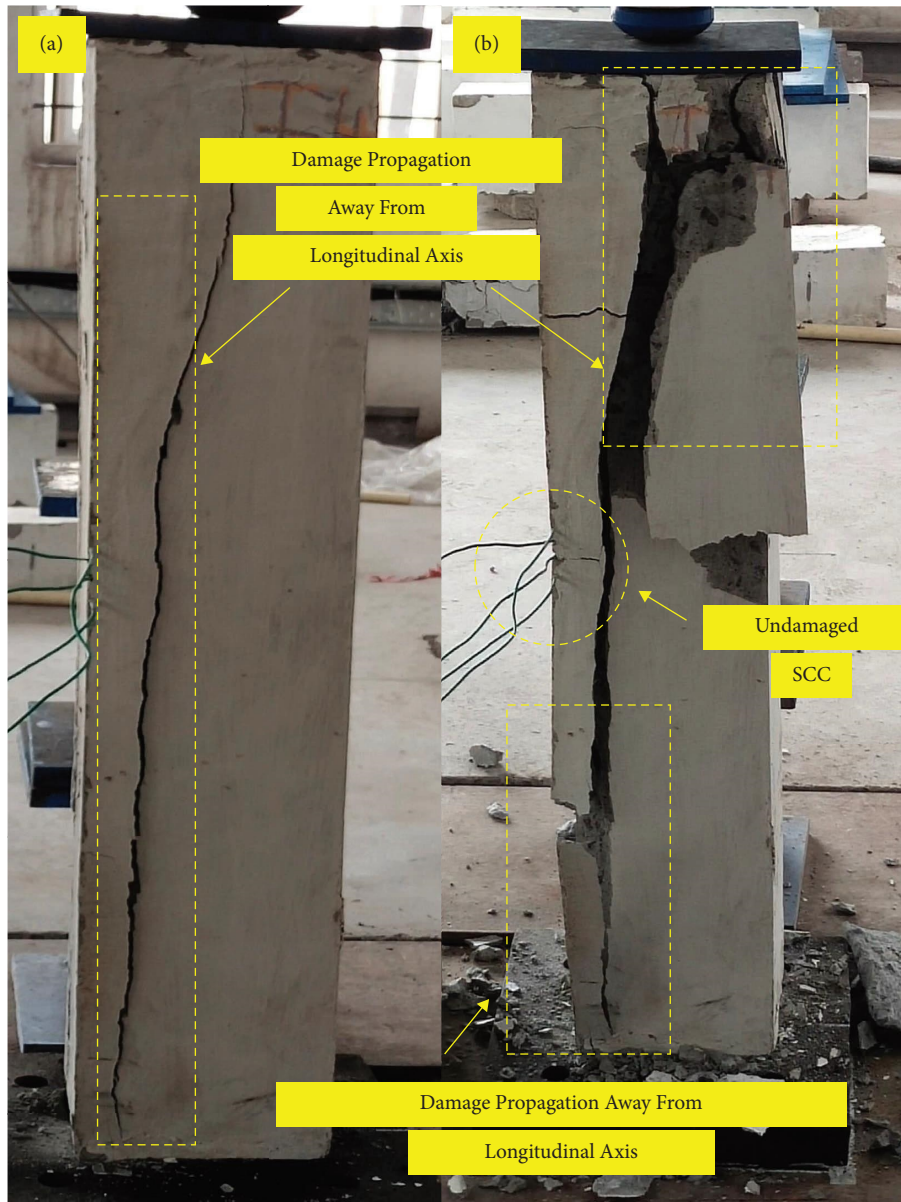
Real-time image of a failed concrete column with embedded SCC integrating AC, showing (a) concrete damage propagation away from the longitudinal axis of the column and (b) undamaged SCC at column center with crack penetration away from SCC.
